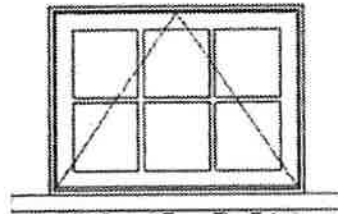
Proposed window type on the south elevation of the new addition (bathroom).
